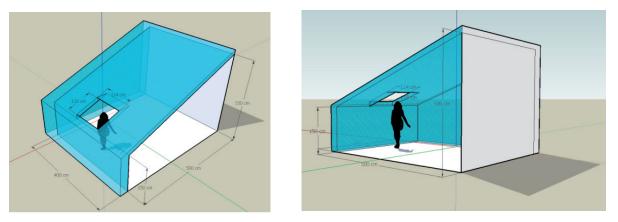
Attic room seen from the south east and from the north east. Only the façade and the roof are facing the outside. Building type used in new residential building in Germany and France.
